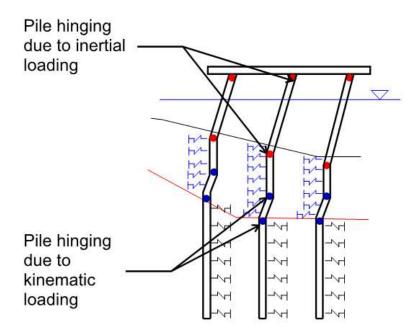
Combined Pile Hinge Locations for Inertial and Kinematic Loading
